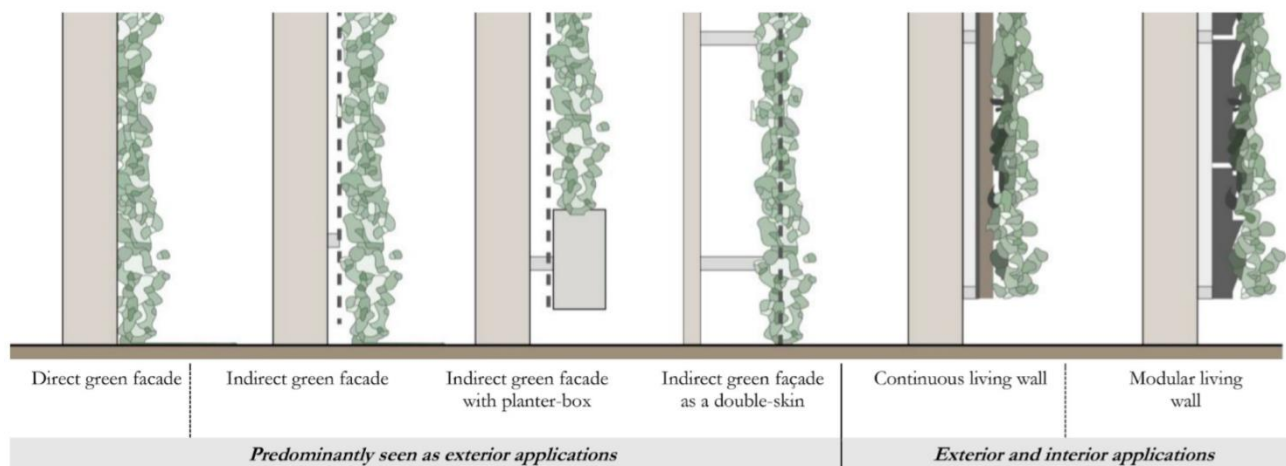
Vertical Greening Categories and Some Exemplar Variants. Gunawardena, K., & Steemers, K. (2019). Living walls in indoor environments. Building and Environment, 148, 478-487.
